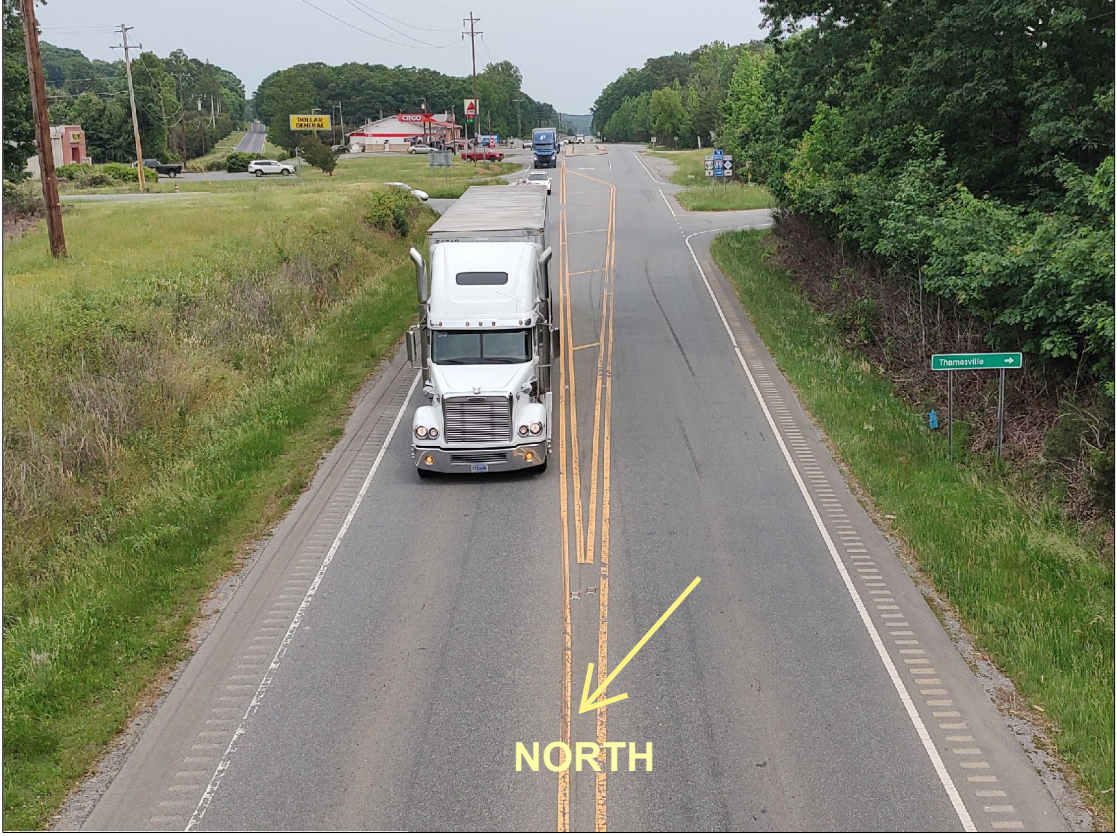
VIEW LOOKING SOUTHEAST ALONG US 64 FROM EXISTING BRIDGE DECK.
